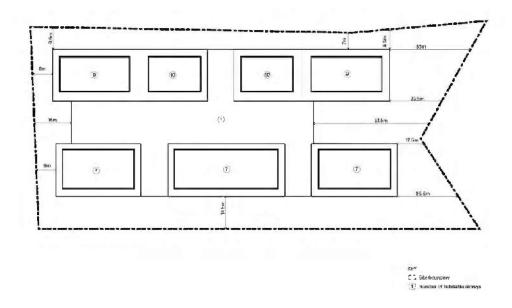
Concept site specific DCP chapter showing indicative setbacks and building heights (in storeys) (Source: Gyde Consulting)
